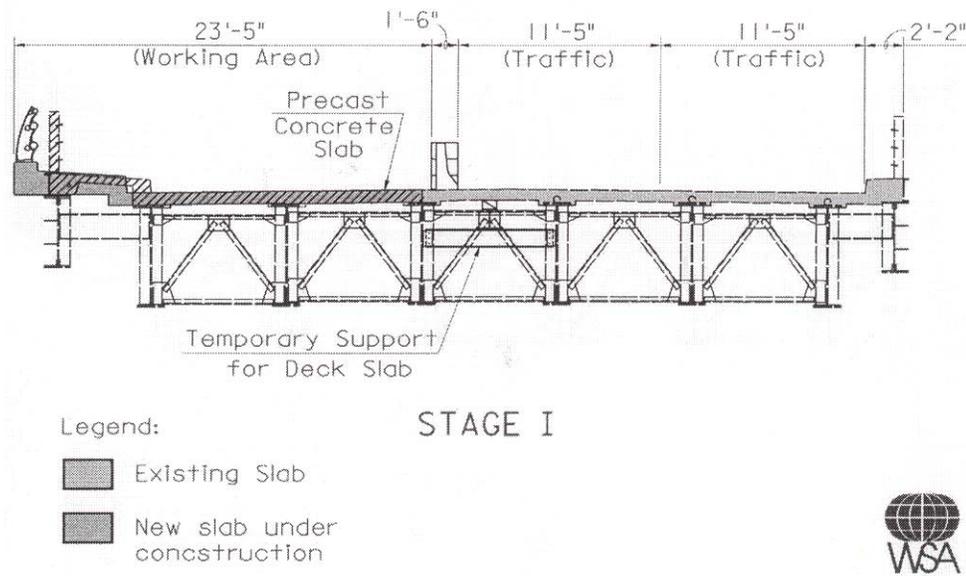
Cross section of bridge during first stage of slab replacement. [Source: Babaei et al. (1).]
